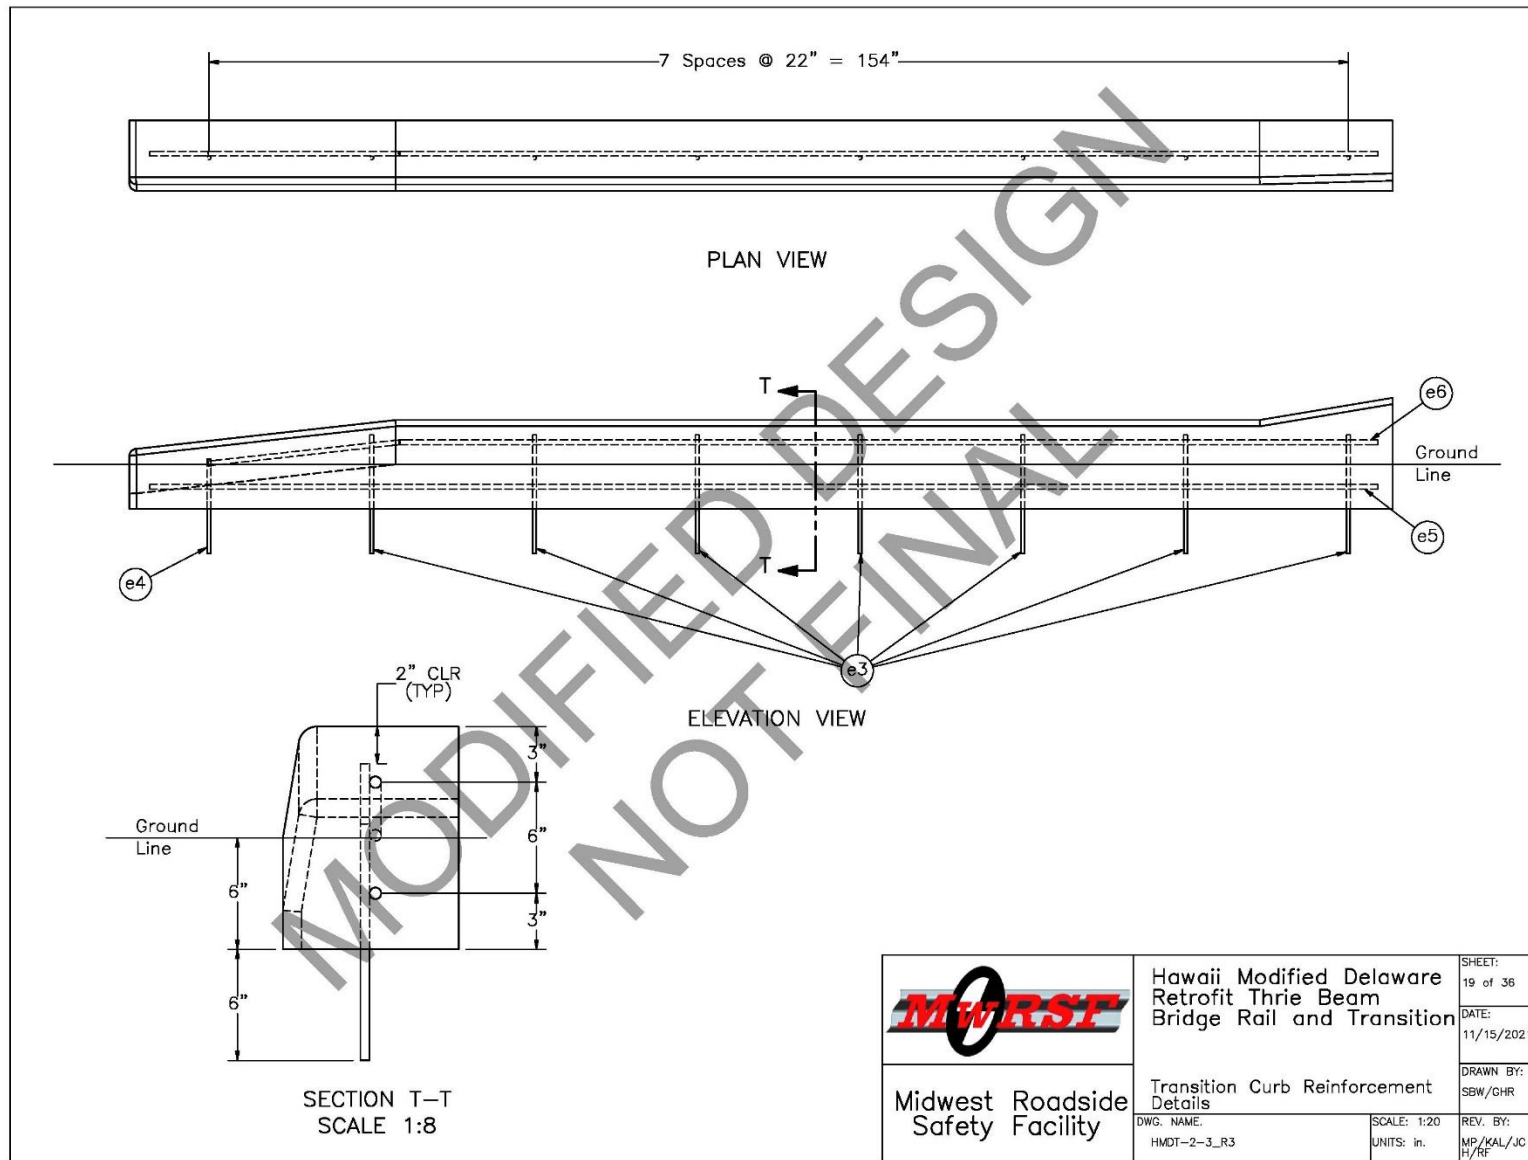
Transition Curb Reinforcement Details, Test Nos. HMDT-2 and HMDT-3
